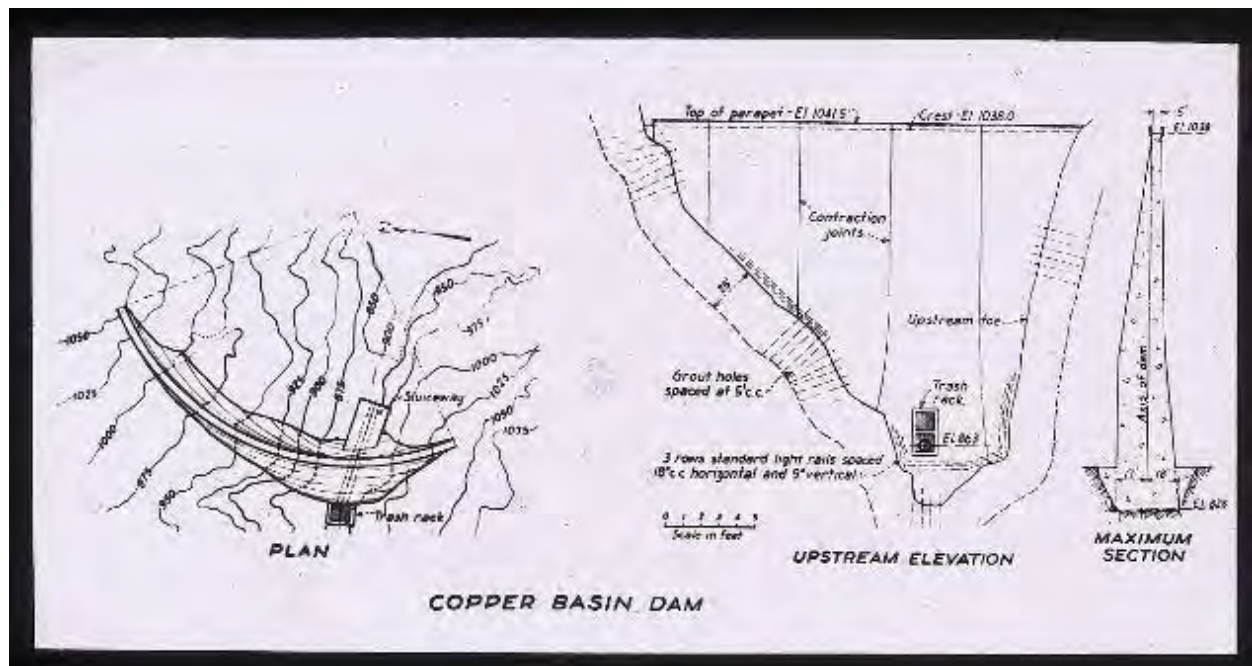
Copper Basin Dam Building Plan, circa 1938. Source: Metropolitan
